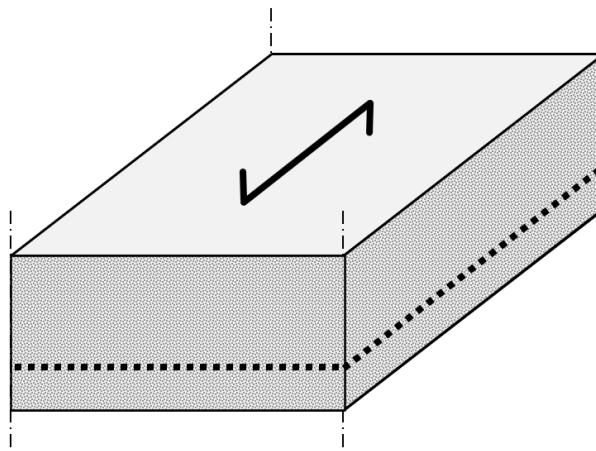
Graphic interpretation of a concrete cast insitu panel
